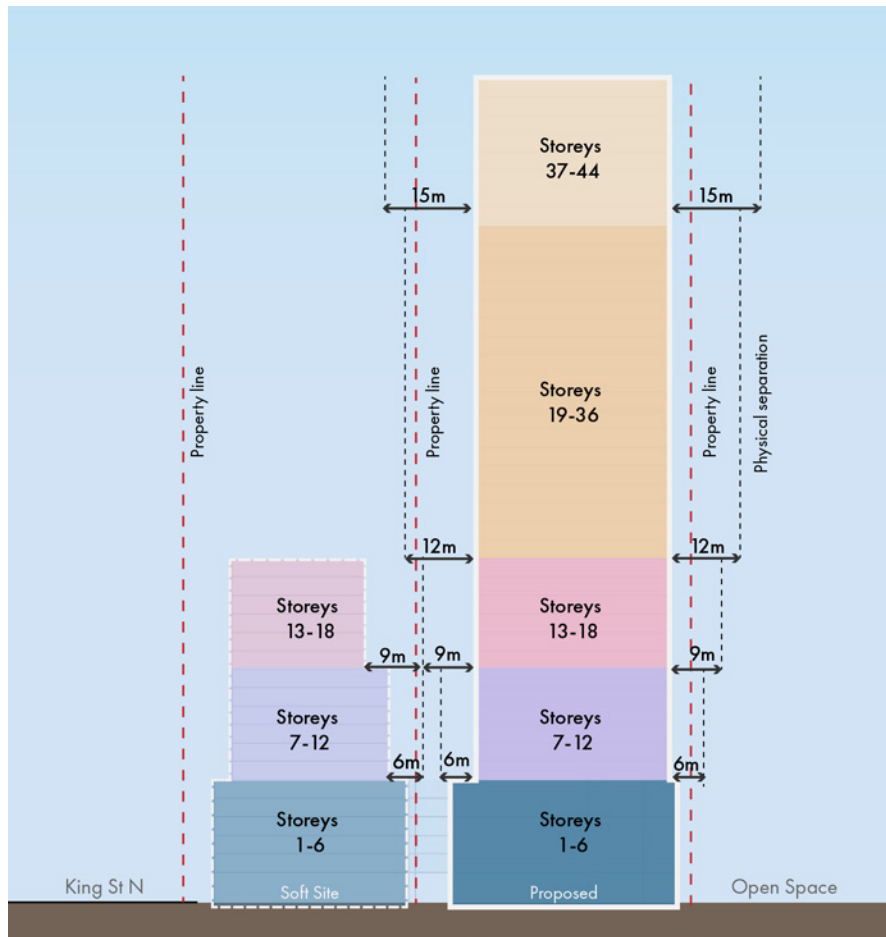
Section A showing the separation between the proposed tower and potential tower on King St W
